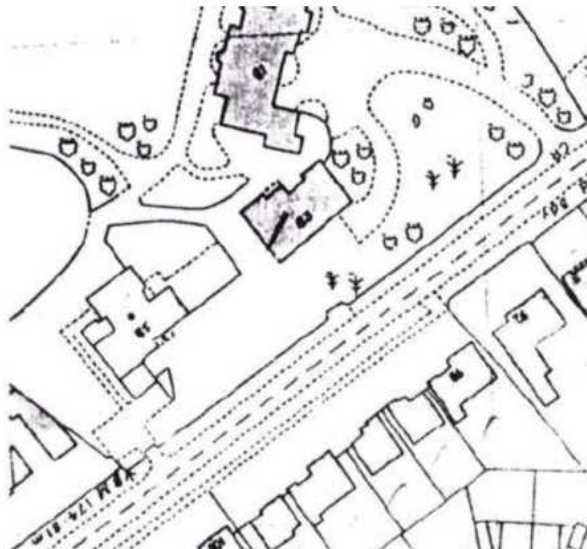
Block plan of 85 Stonnall Road as stood in 1989. Neighbouring properties are shown.
